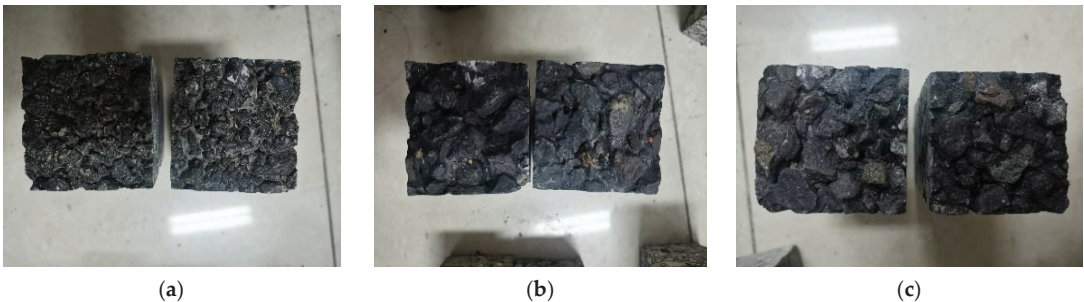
Specimen surfaces after the accelerated loading test. (a) I-6; (b) II-1; (c) II-3.
